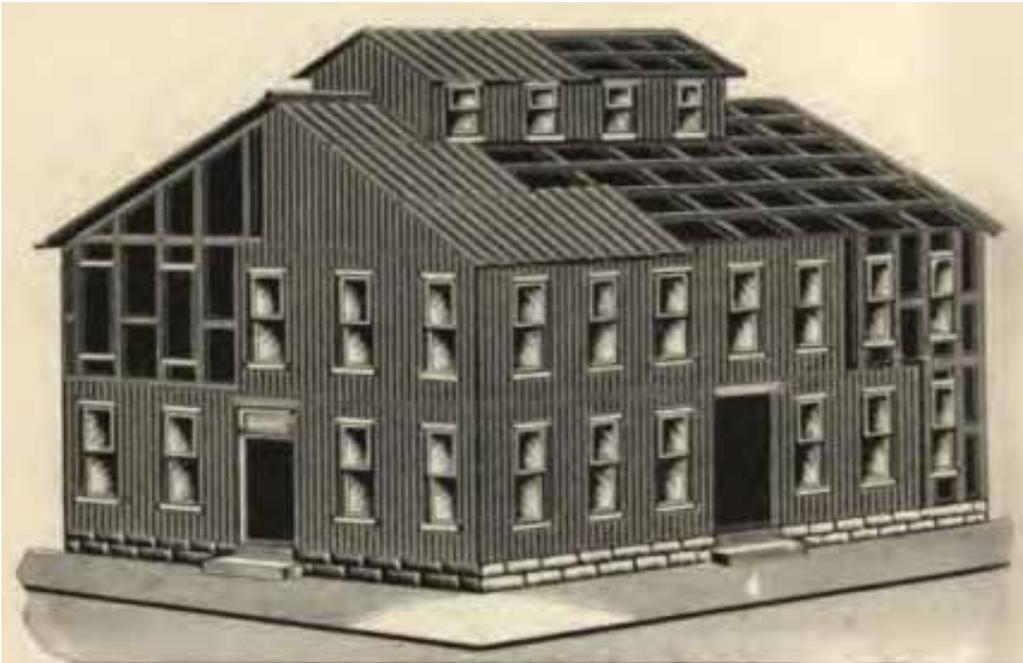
An example of corrugated metal roofing and siding used on a skeleton frame building (Milwaukee Corrugating Co. 1920:154).
